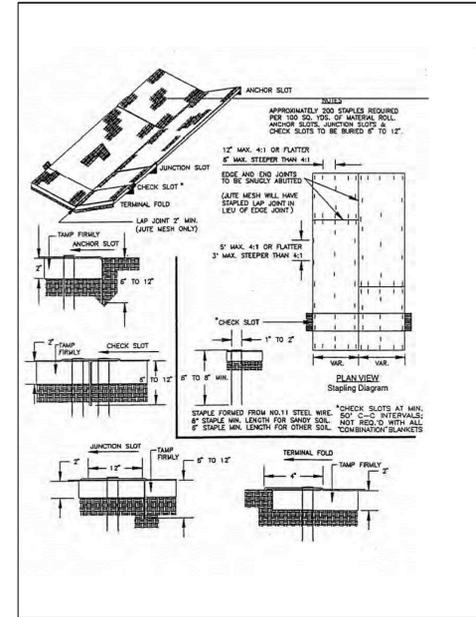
Typical Treatment 1 – Soil Stabilization Blanket Installation Guide
